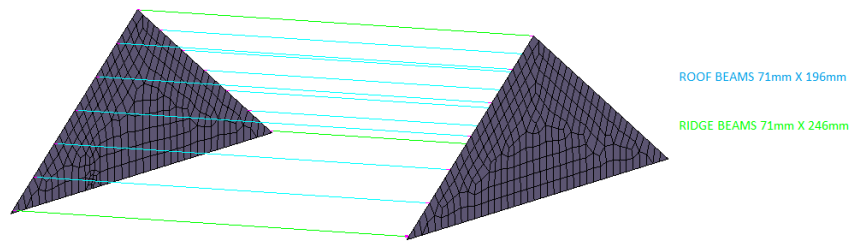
MODELLING OF CONNECTIONS BETWEEN ROOF BEAMS AND MASONRY WALLS
